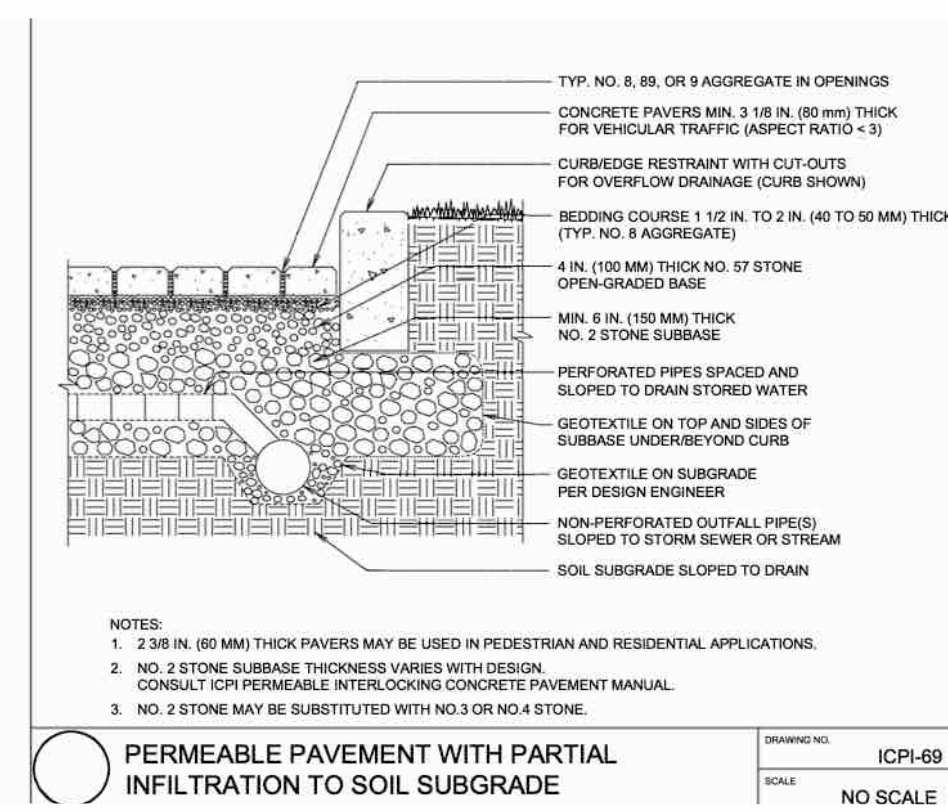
PERMEABLE PAVEMENT WITH PARTIAL INFILTRATION TO SOIL SUBGRADE
